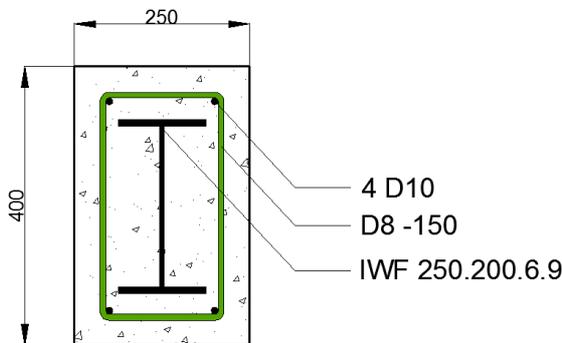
The detail of strengthening by adding the reinforcement bars.
